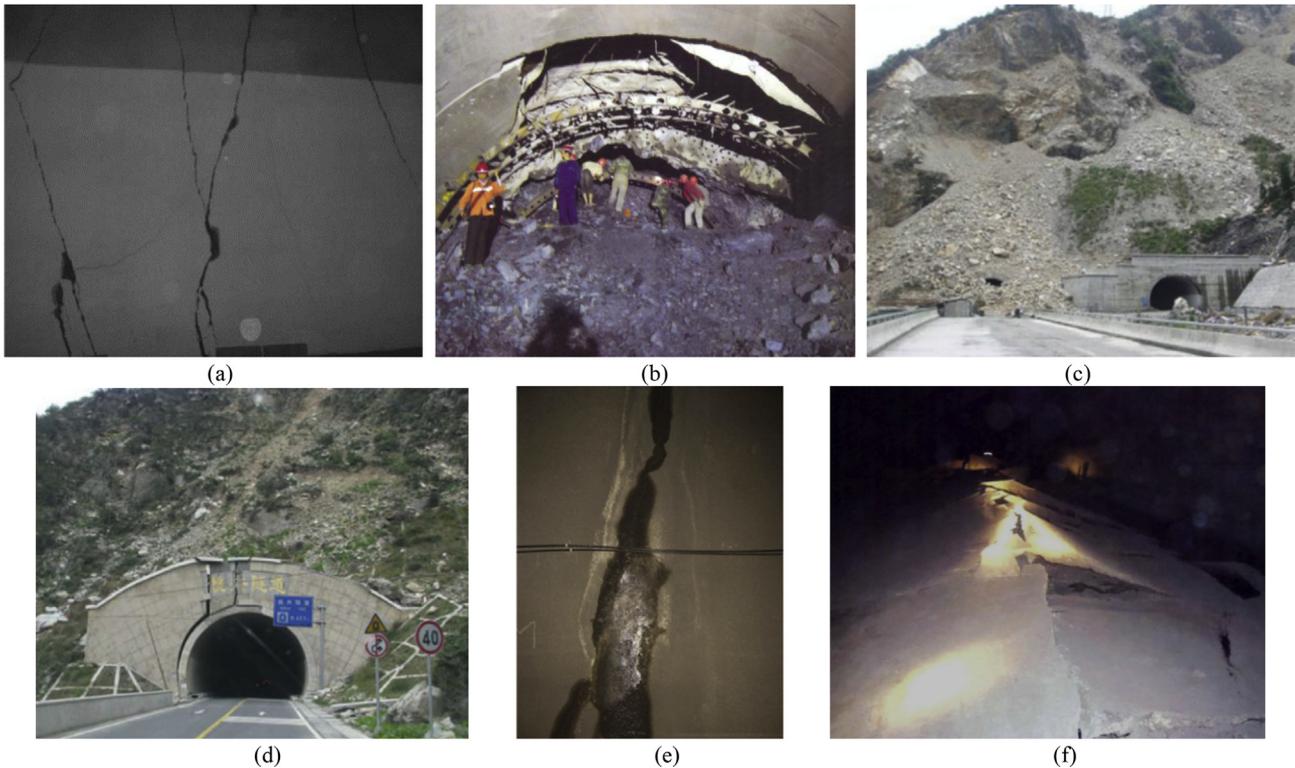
Six most frequent damage characteristics of mountain tunnel subjected to earthquakes: (a) Lining cracks (Shen et al., 2014); (b) Shear failure of lining (Wang et al., 2001); (c) Collapse by slope failure (Li, 2012); (d) Portal cracking (Shen et al., 2014); (e) Groundwater leakage (Chen et al., 2012); and (f) Invert damage (Yu et al., 2016a).
